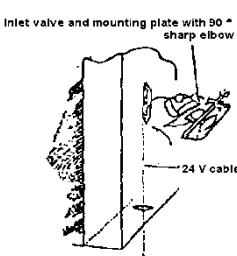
7.8. Connecting pipe to backing plate.
